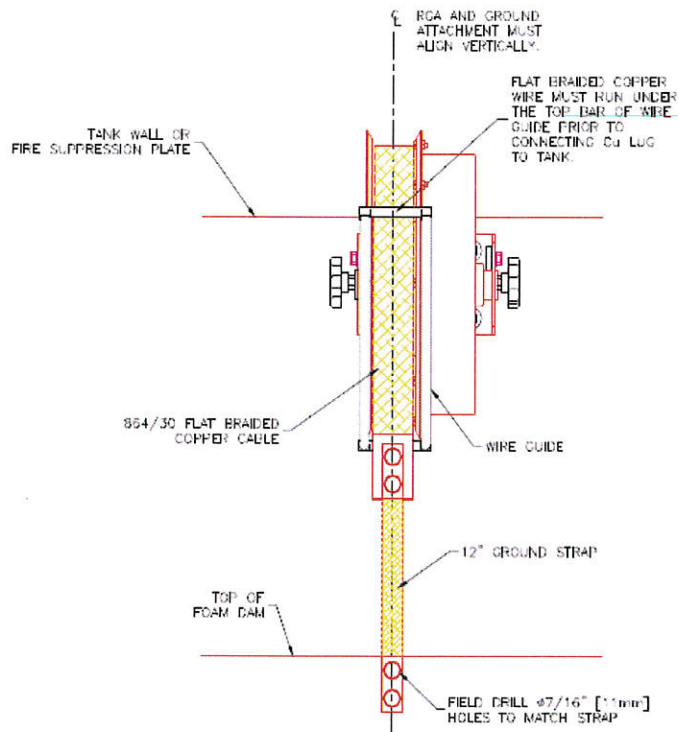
Horizontal Mounting Bracket with RGA Assembly
